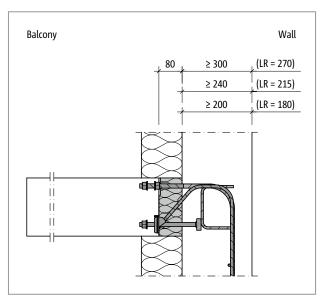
Schöck Isokorb $^{\otimes}$ T type SK-WU: Special construction for wall connection
